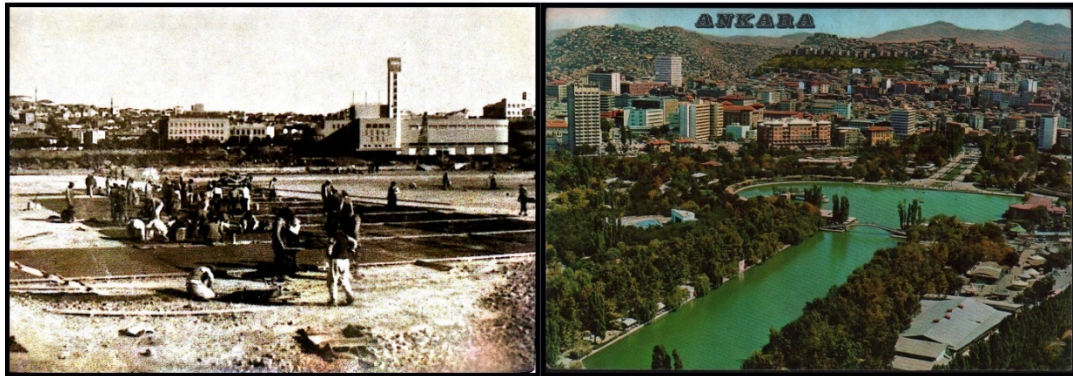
While the Youth Park pool was under the construction and after construction.
